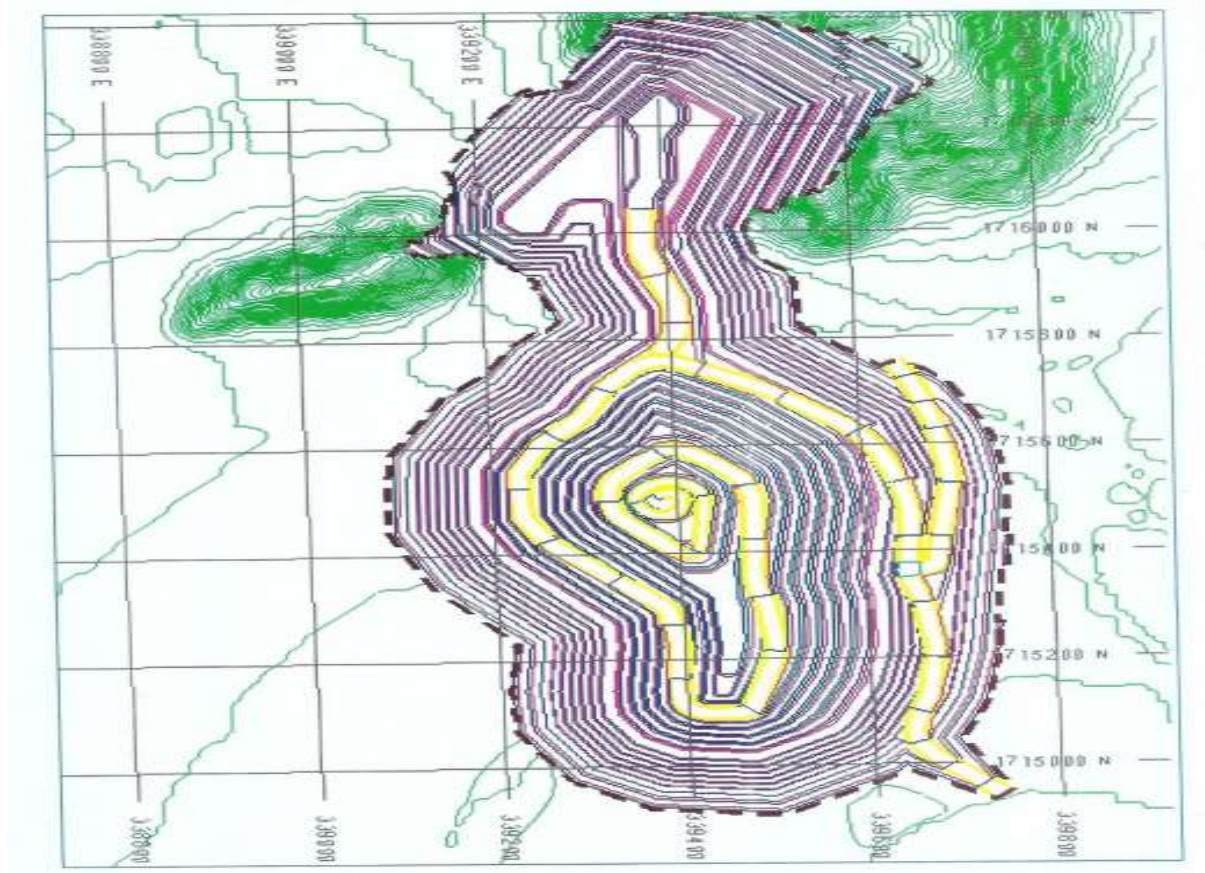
Base Detailed Pit Detailed with Ramps and Berms
